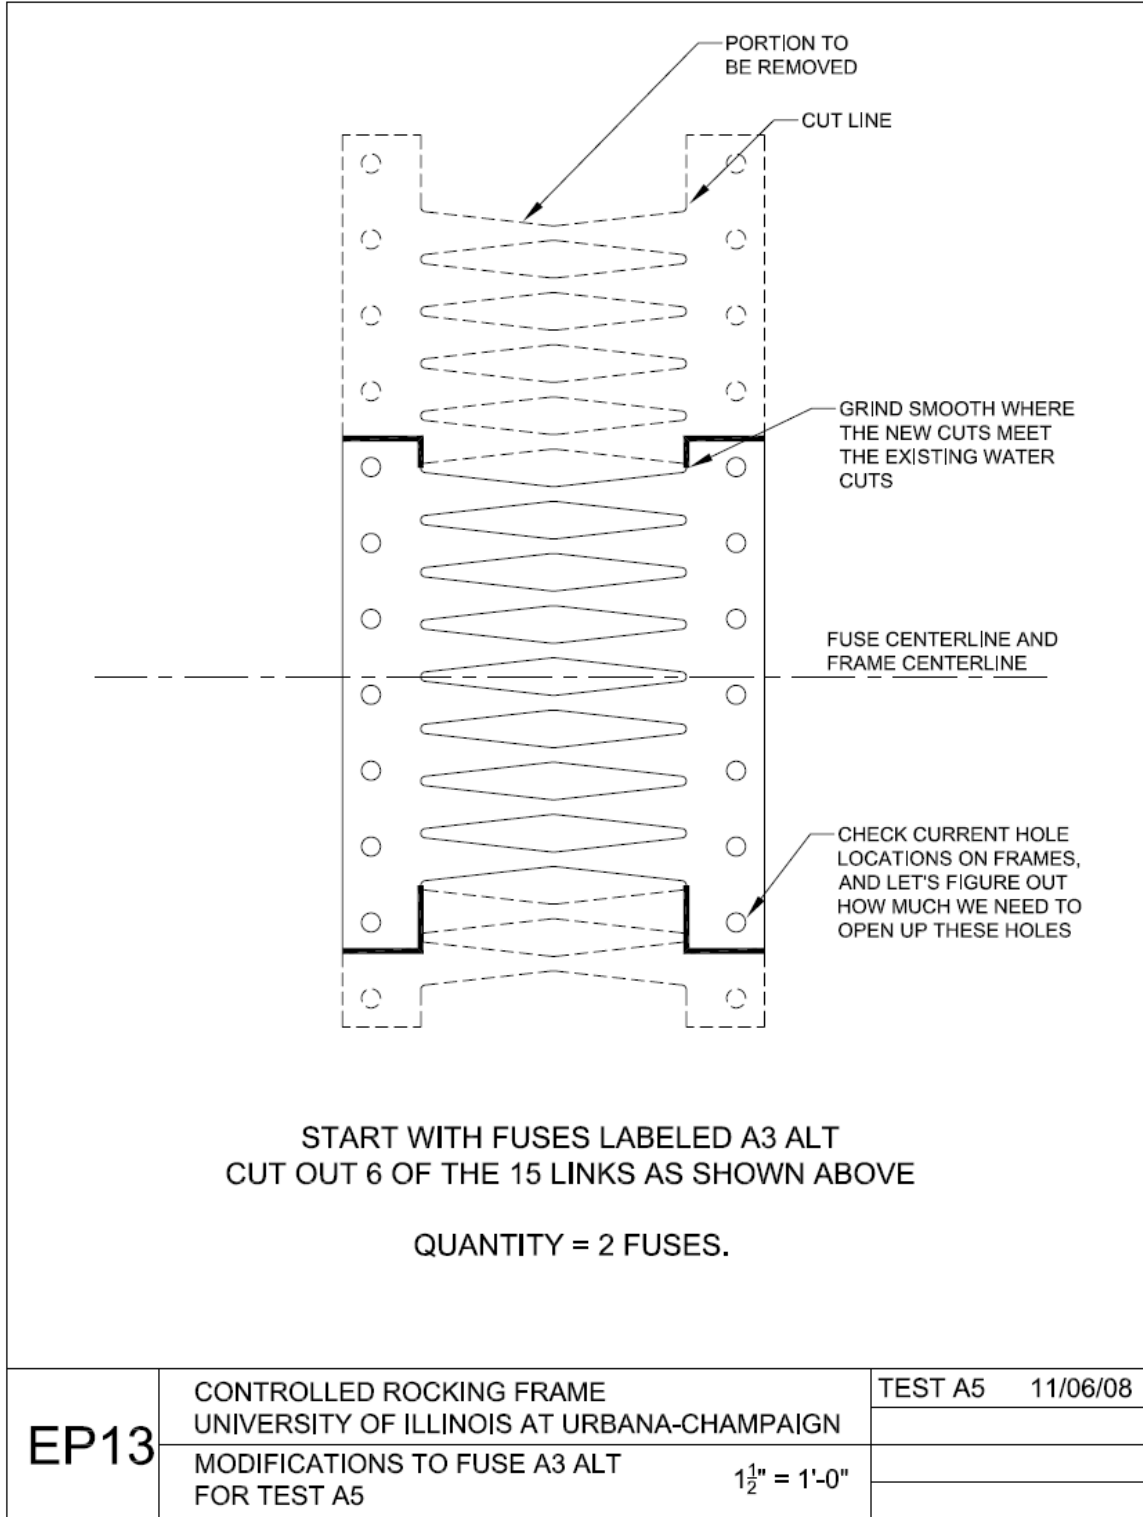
Erection Plan Drawing – Modifications for Specimen A5 Fuse
